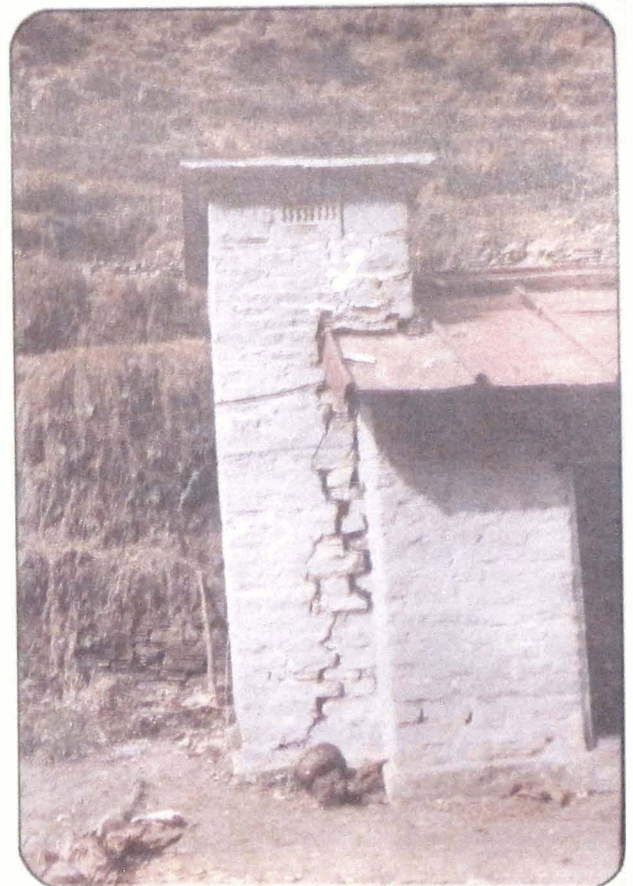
Separation and cracking of chimney in the out house of PWD Rest House, Gaurikund.
